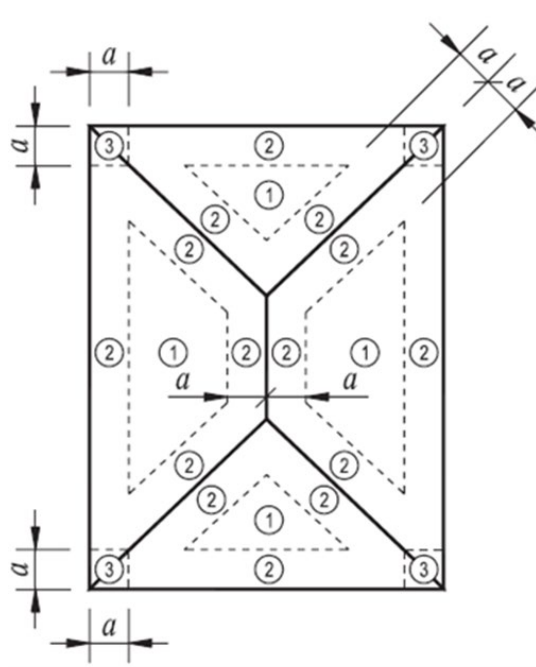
Proposed zoning area for hip roof with overhangs; same as ASCE 7-10
